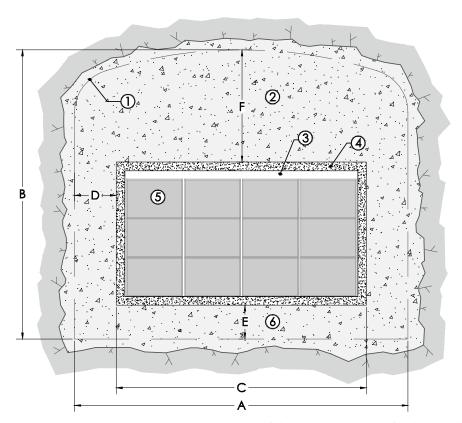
Schematic cross-sectional layout of the repository section for the metallic waste designed as a cavern. Legend: 1) Theoretical tunnel contour. 2) Concrete. 3) Grout. 4) Reinforced concrete (0.5 m). 5) Steel tank. 6) Concrete. Approximate dimensions: A = 20 m, B = 17 m, C = 15 m, D = 2-3 m, E = 2 m, F = 5-10 m.
